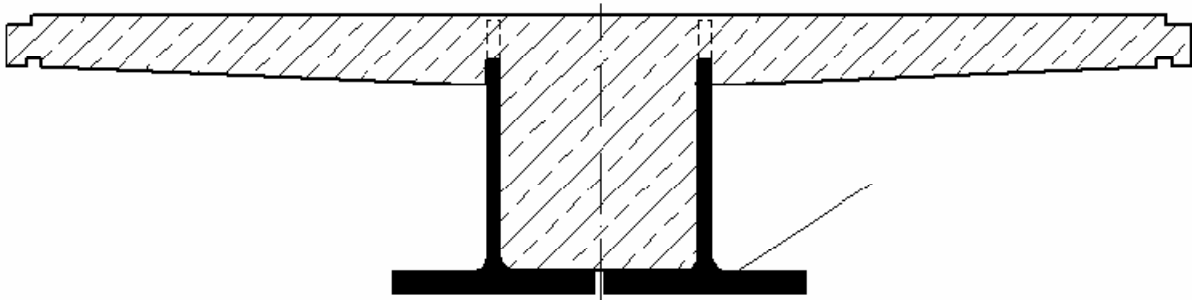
VFT-mono-WIB with unlimited construction height because of concrete web, also haunched girders are feasible.
